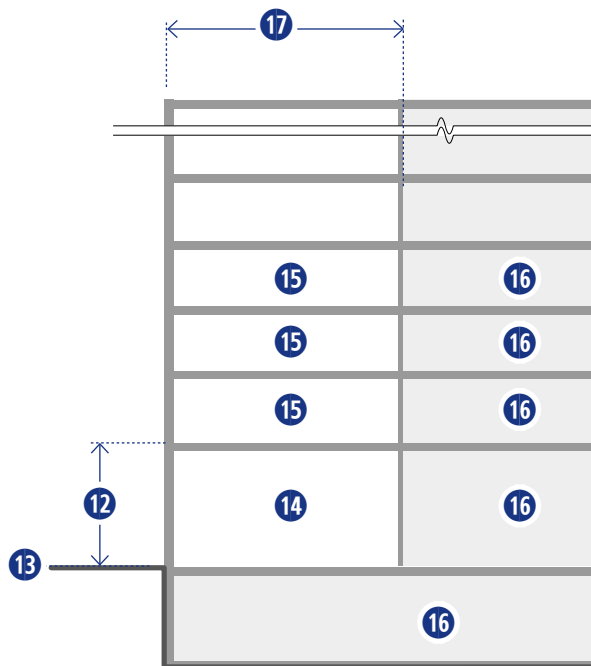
Shopfront Building: Floor-to-Floor Height & Use Requirements
